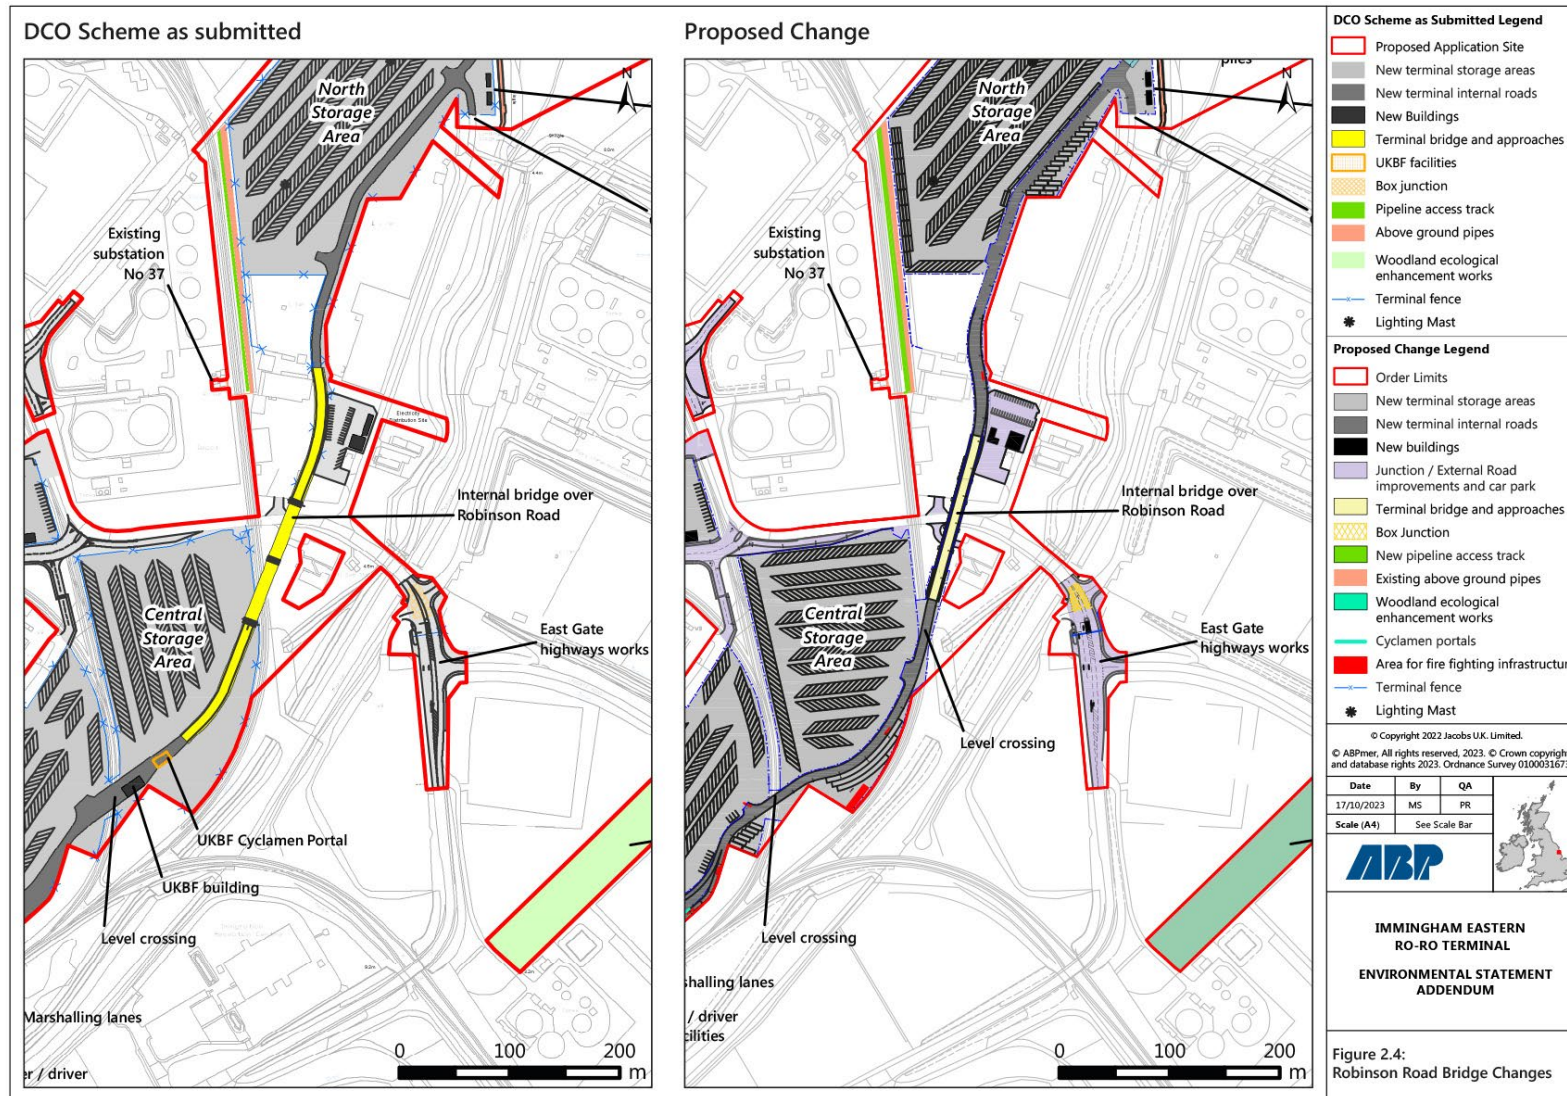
Proposed Change 2: Realignment and shortening of the IERRT internal bridge
